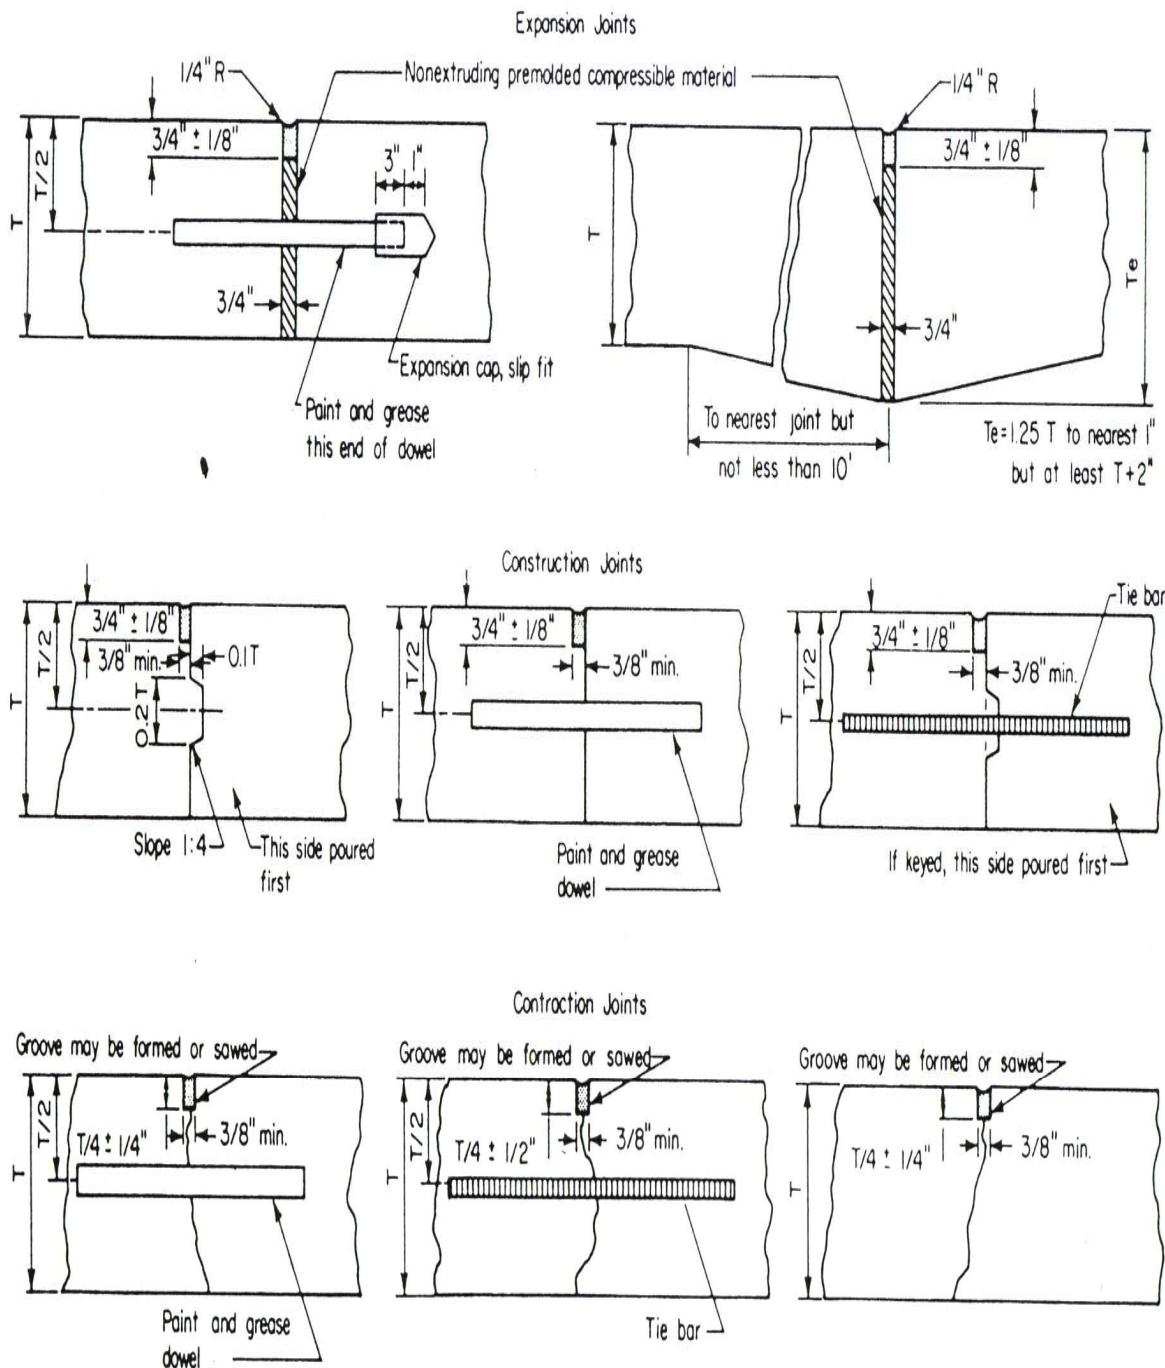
Details of joints in rigid pavements. Shaded area is joint sealer. (Federal Aviation Administration [9]).
